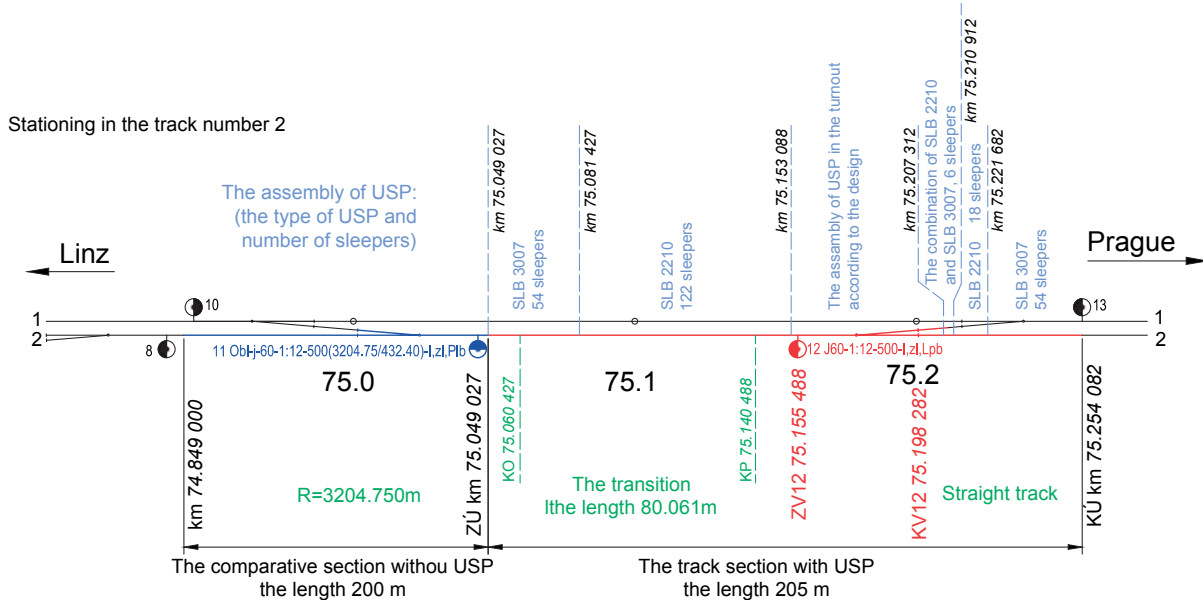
The scheme of the test track section for USPs in the turnout in Plana nad Luznici railway station
